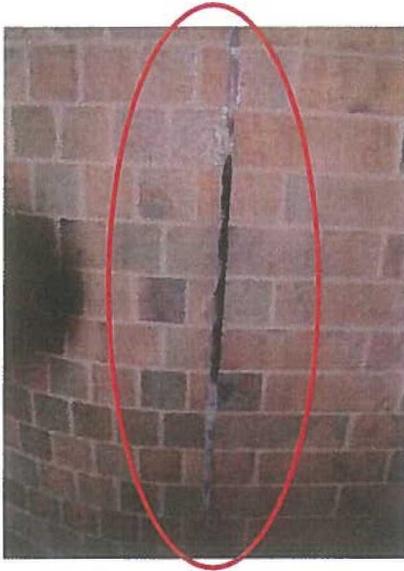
The photo above shows one of the many cracks in the masonry block walls of the stair towers.
